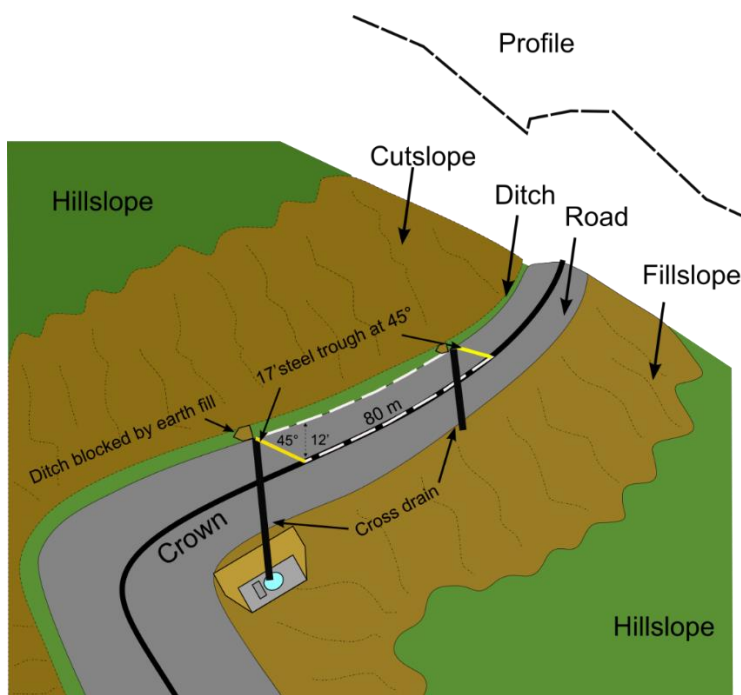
Configuration of an 80-meter segment. Ditch (in green) is blocked below each cross-drain culvert by earthen headwall. Steel trough is 5.2 m-long and placed on a 45-degree angle up the road to capture 3.66 m of the crowned road tread and drain into the ditch line .3 m above each cross-drain culvert inlet. The lower cross-drain culvert is on a strong skew to create a 5% gradient in the pipe, and it extends several feet beyond the edge of the tread to a platform that holds the sediment tub, tipping bucket and SST.
